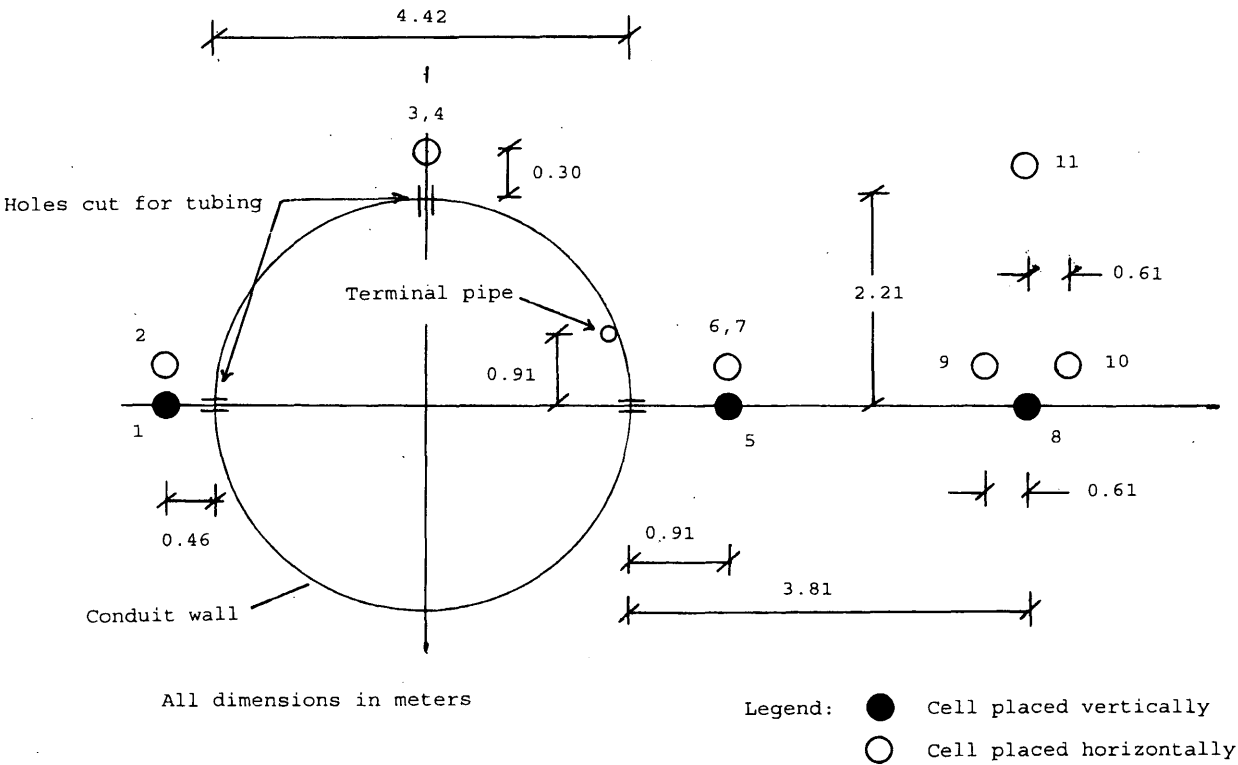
Elevation view of instrumentation layout for conduit (looking upstream).
